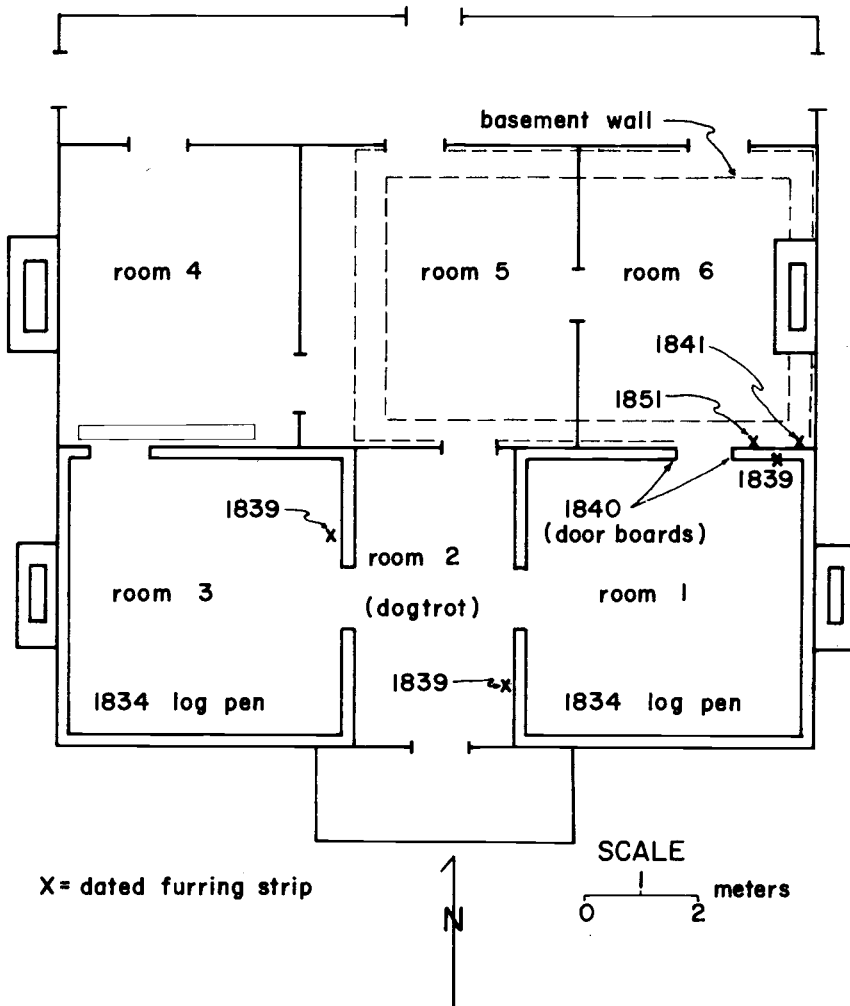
Plan view of the Sarah Ridge House (ground floor) showing the location of dated furring strips and door boards, and the association of the basement with the original double-pen log house. All dates shown are cutting dates except 1841 (non-cutting date) and 1851 (probable cutting date).
